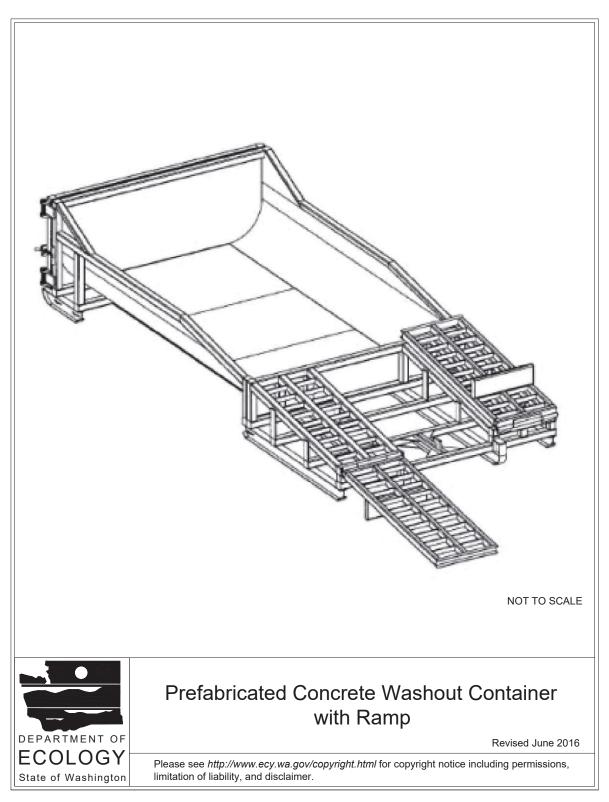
Prefabricated Concrete Washout Container with Ramp
